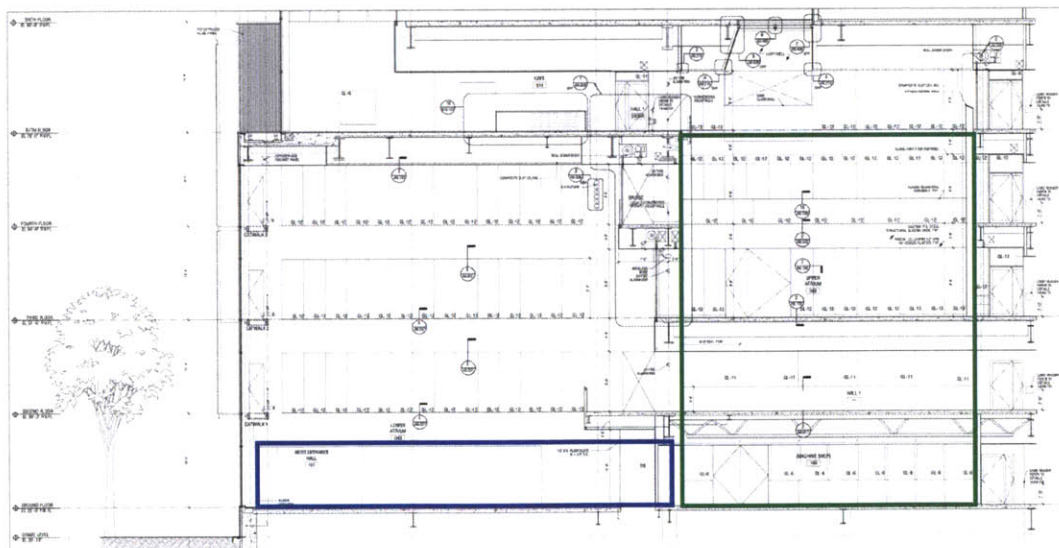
Section view of the single-story foyer (blue) and atrium (green).
